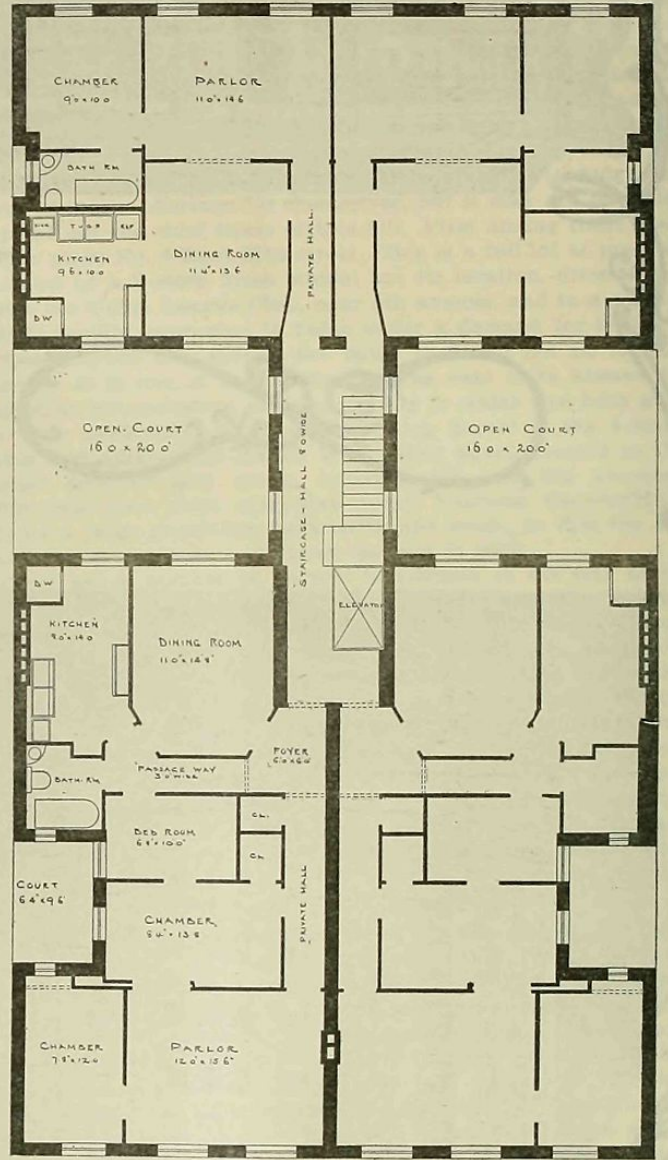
Floor plan recommended for the convenient arrangement of the apartments, excellent light, ventilation, etc. The apartments will rent for from \$25 to \$40 a month, inclusive.
